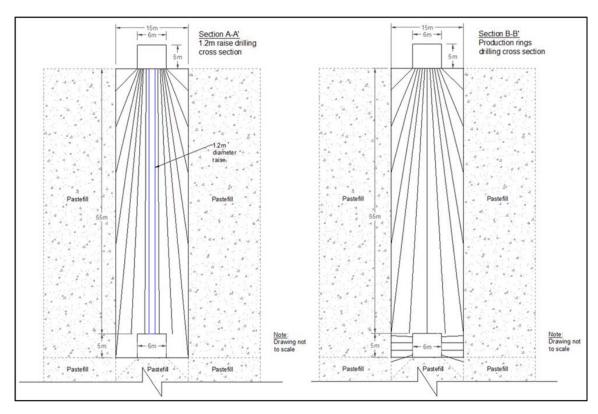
Standard Stope Design Drill Section (secondary stope shown)
